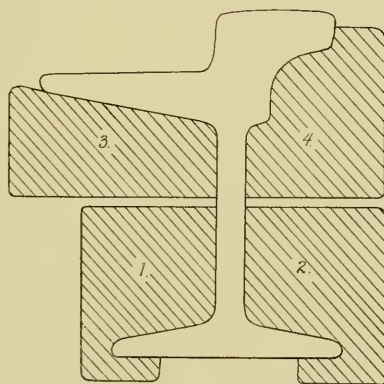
LUGS WELDED TO THE RAILS.
